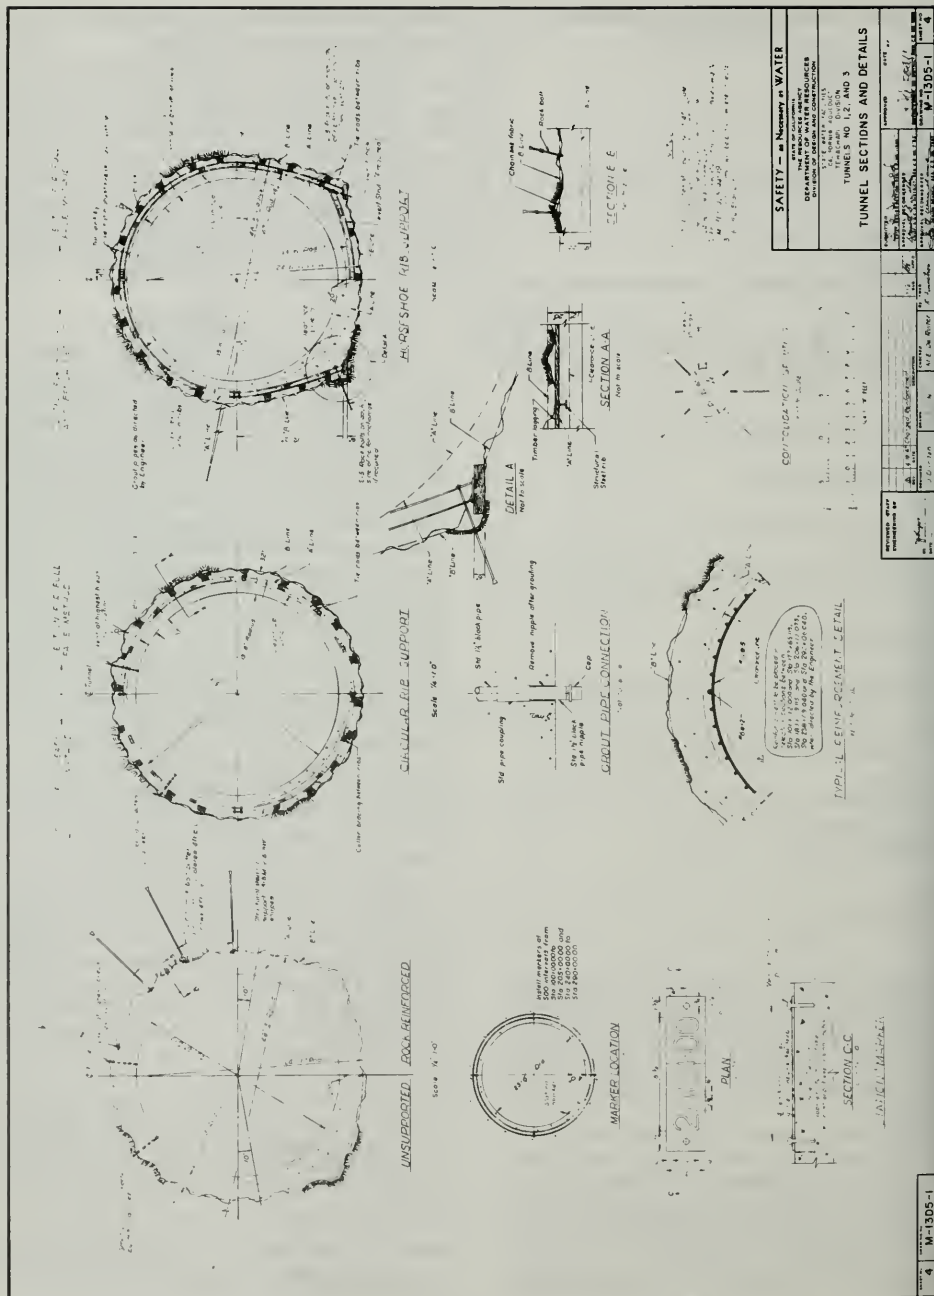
Tunnels Nos. 1, 2, and 3—Sections and Details
